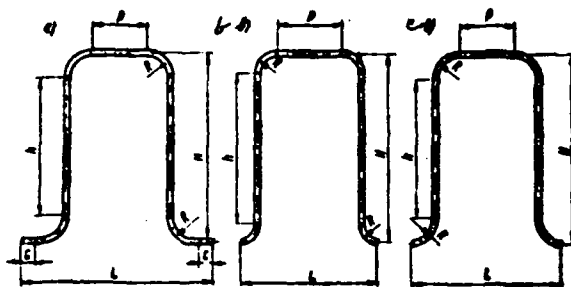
U-shaped compensators. a) bent; b) by the welded sharply bent offtakes; c) with welded offtakes.
